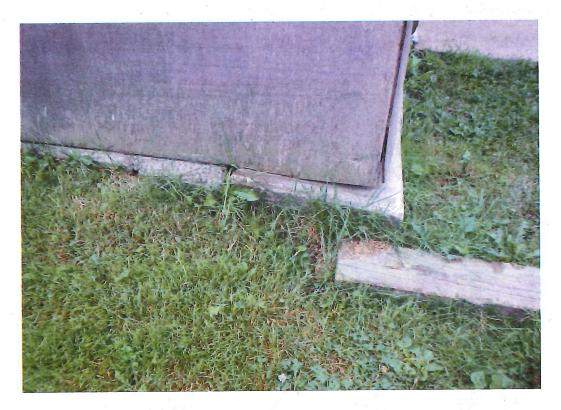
Signs of movement in concrete supporting stud walls of one story shed on west side of building
